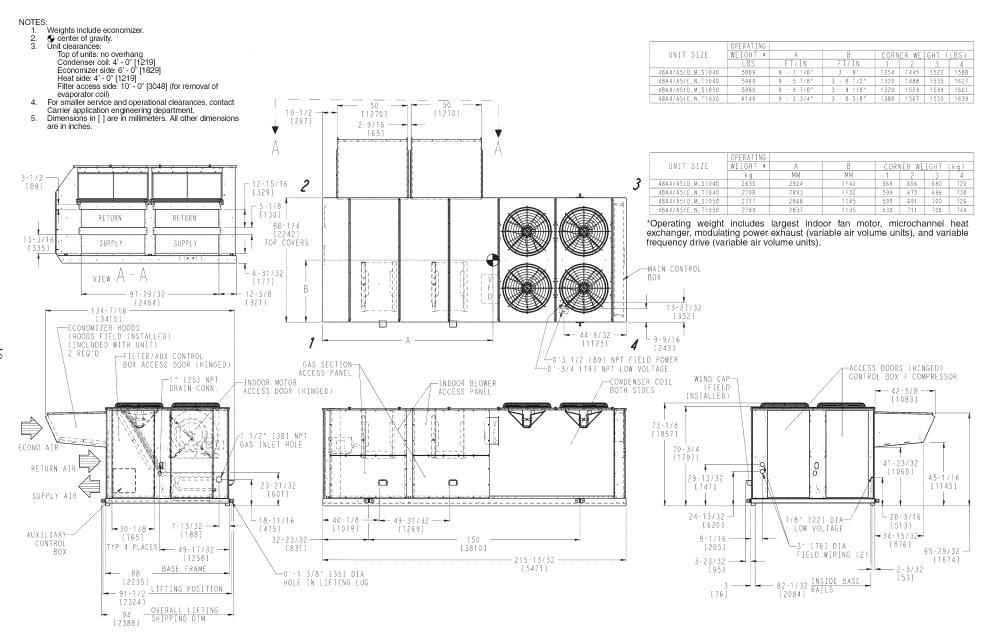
Base Unit Dimensions — 48A4,A5040-050
